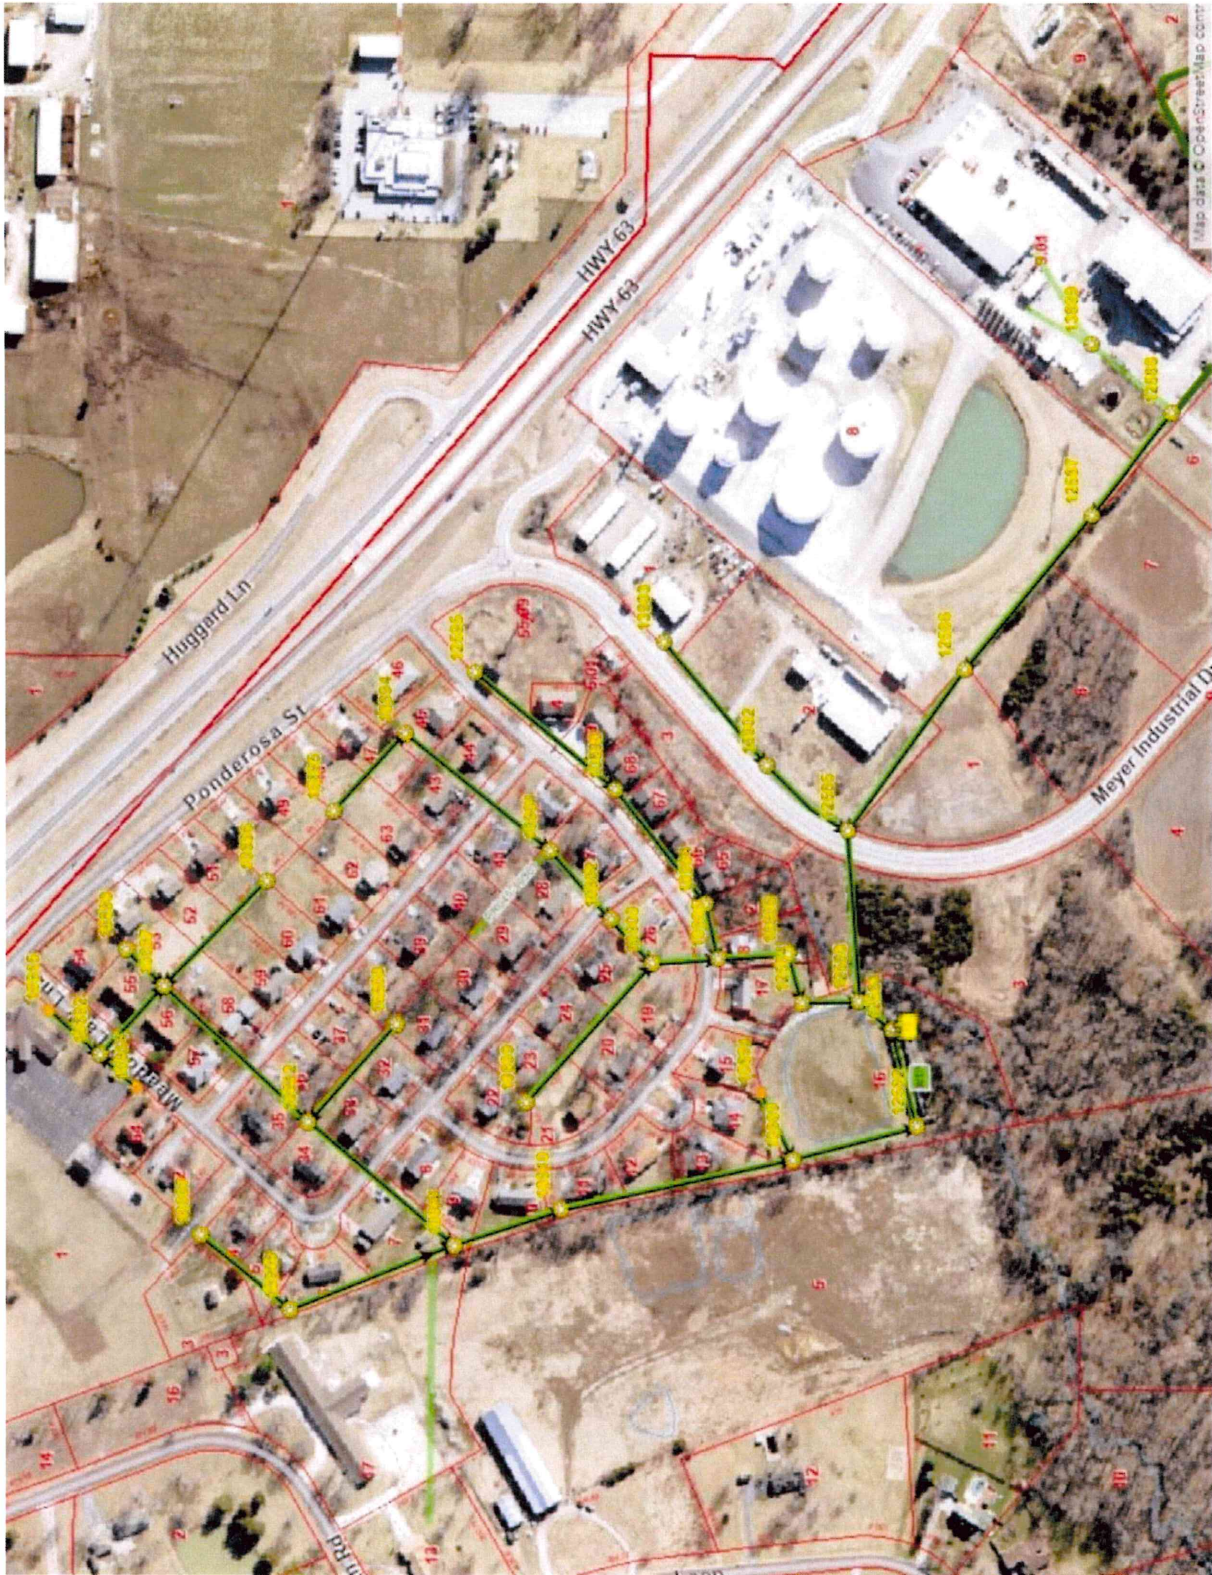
Existing Collection System – Prairie Meadows Subdivision
